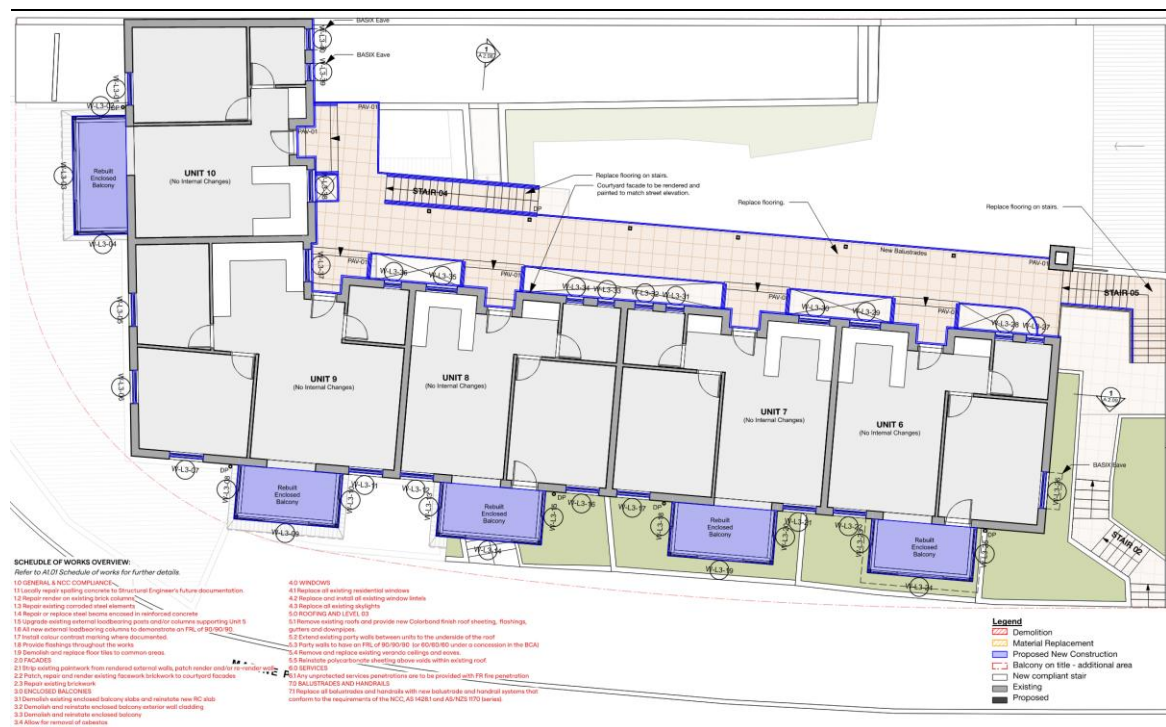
Proposed Level 03 Plan (Source: Hill Thalys – 05/12/2025)
